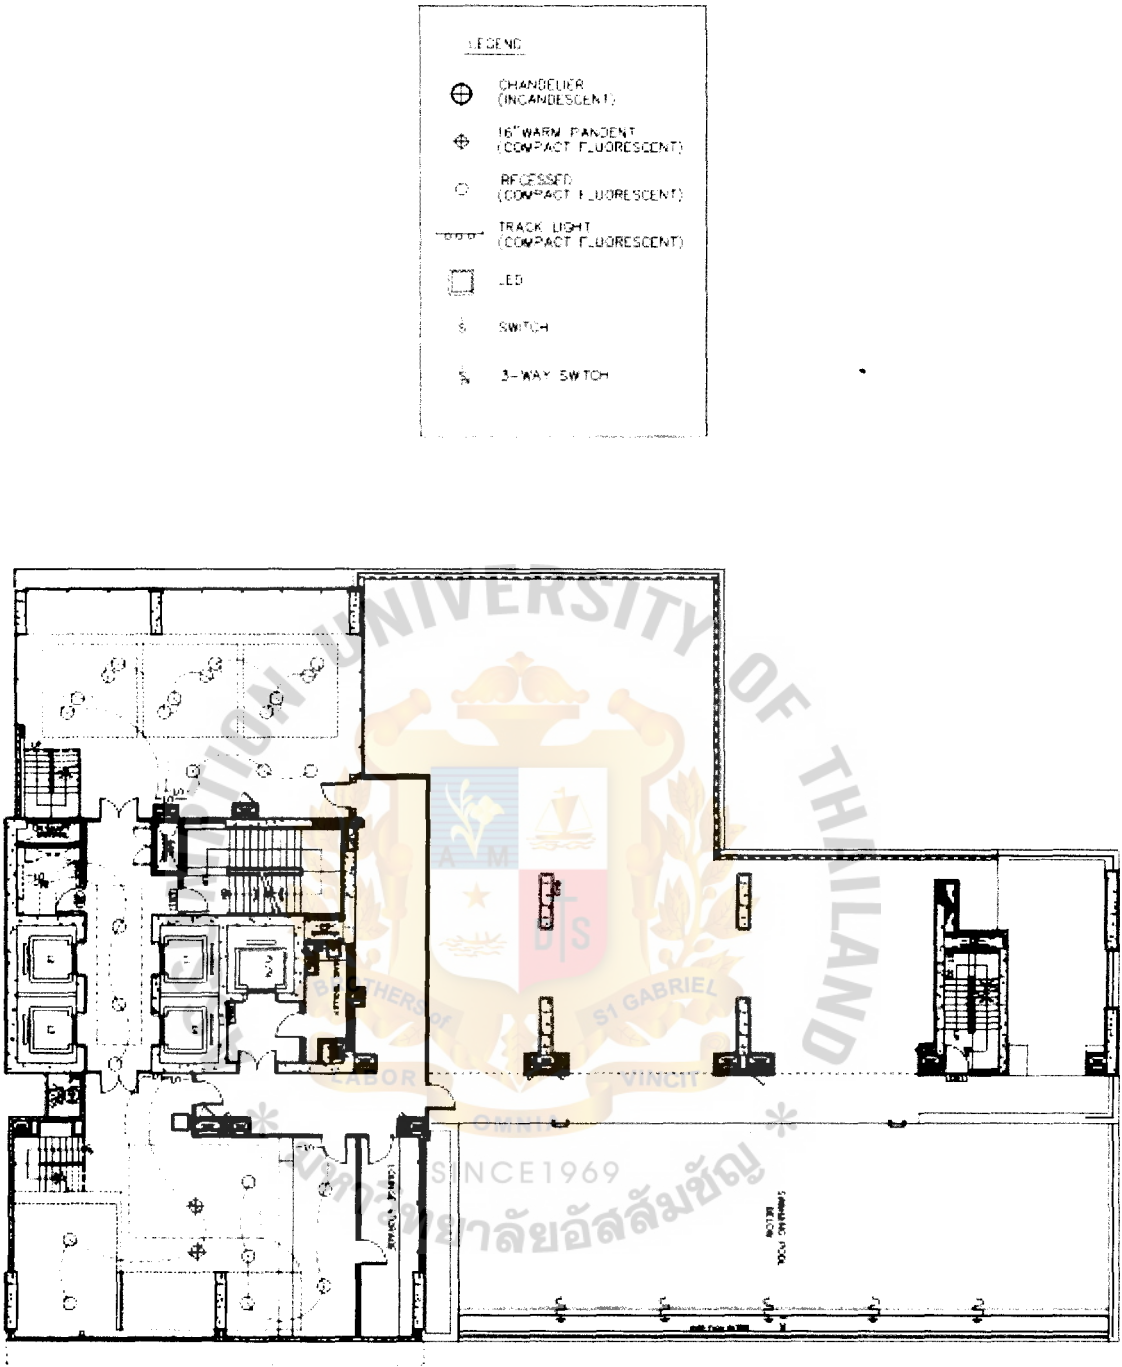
Reflected Ceiling and Lighting Plan of 26th floor plan
